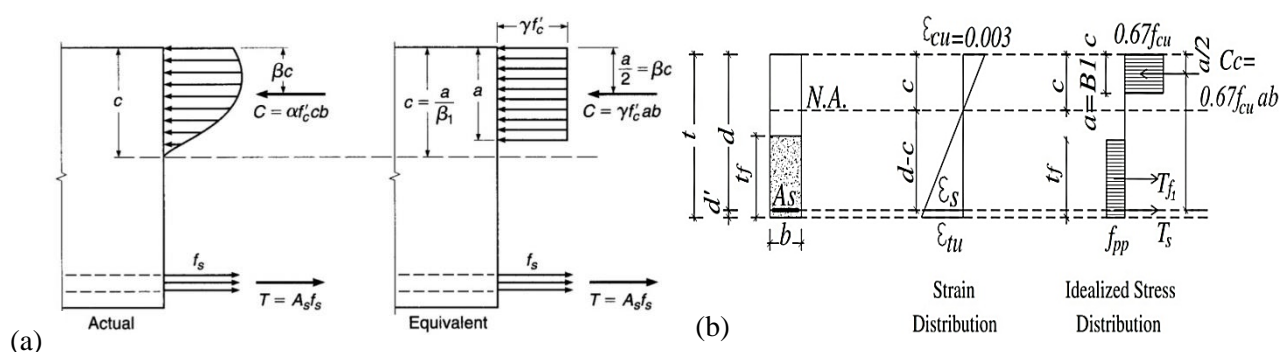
Stress distribution of concrete beam having steel rebars: (a) for plain concrete by Nilson et al. (2010), and (b) for fiber reinforced concrete by Beshara et al. (2012)
